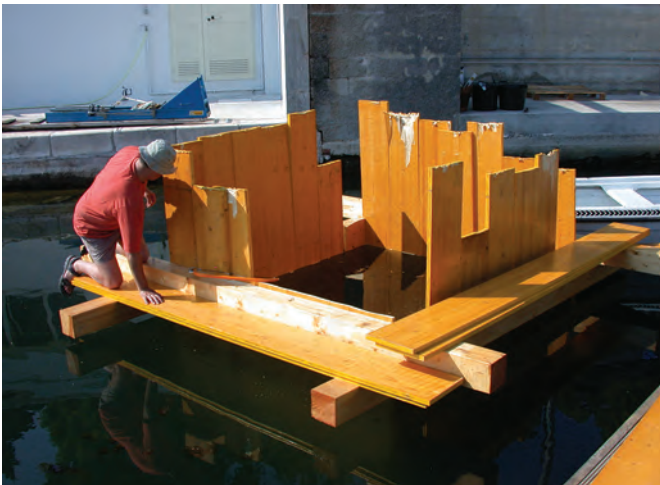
Trimming the formwork planks after installation of shuttering.
